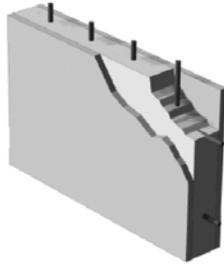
Cross section of a typical insulated concrete form wall (ICF Association, 2005). Concrete is poured between two insulated forms, which then stay in place as a permanent part of the wall assembly.
